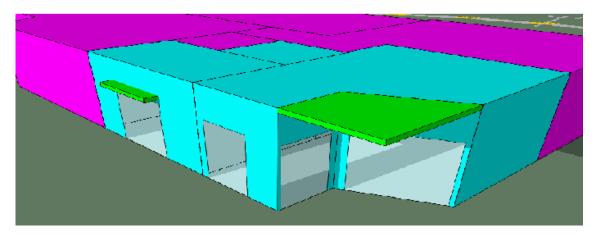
Block JKL 5th Floor Shading. 400mm deep shade required for bedroom, and shade to cover balcony on living/kitchen room corner
